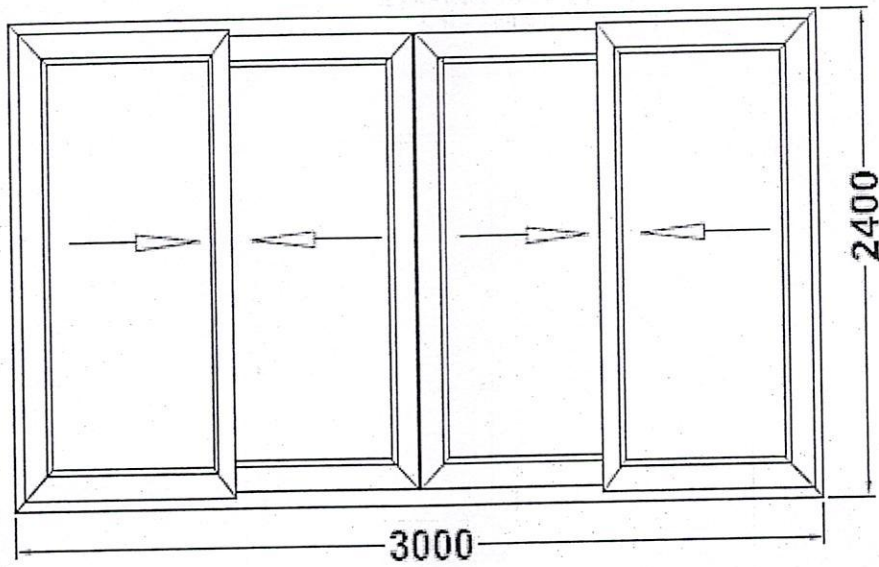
uPVC Doors and Windows (Typical casement system)
